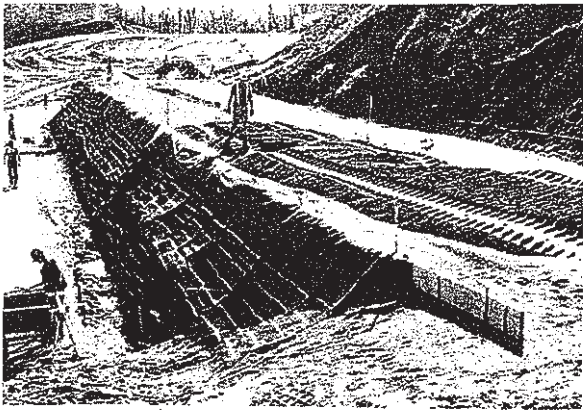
Temporary Form Placement to Maintain Shape of the Wall Facing
